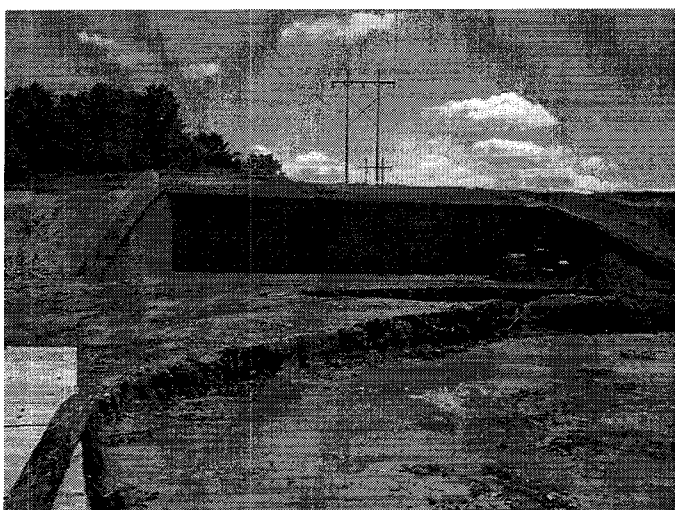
View of excavation and retaining wall behind STATCOM building location (June 2000).
